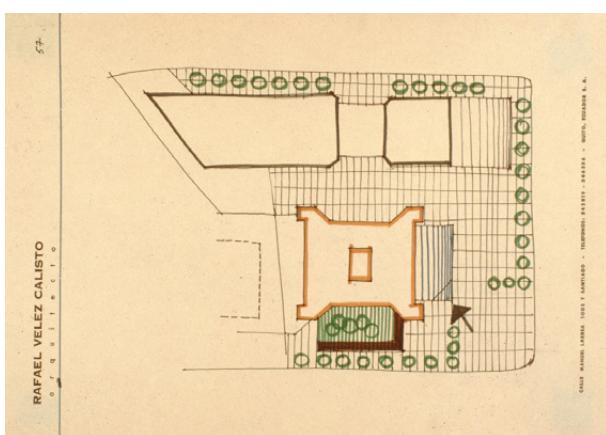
Sketch of the proposed access location from Juan Pablo Sanz Street, Banco Popular Main Building. S/E. (Source: Archive Rafael Vélez Calisto).
